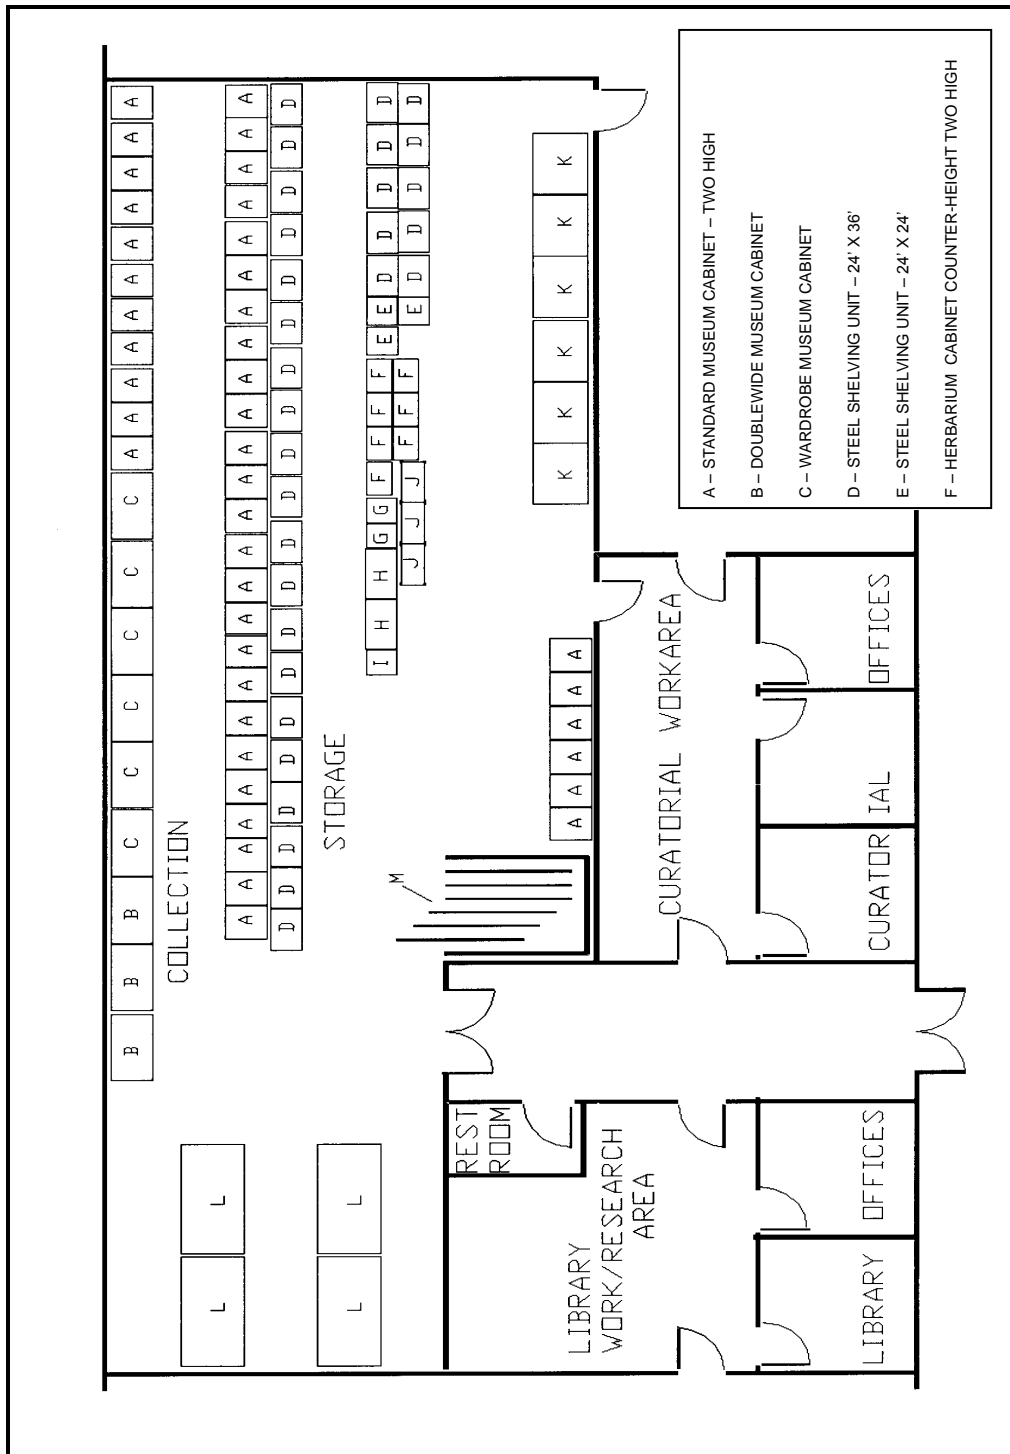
Sample Detailed Floor Plan of Museum Collection and Work Space
